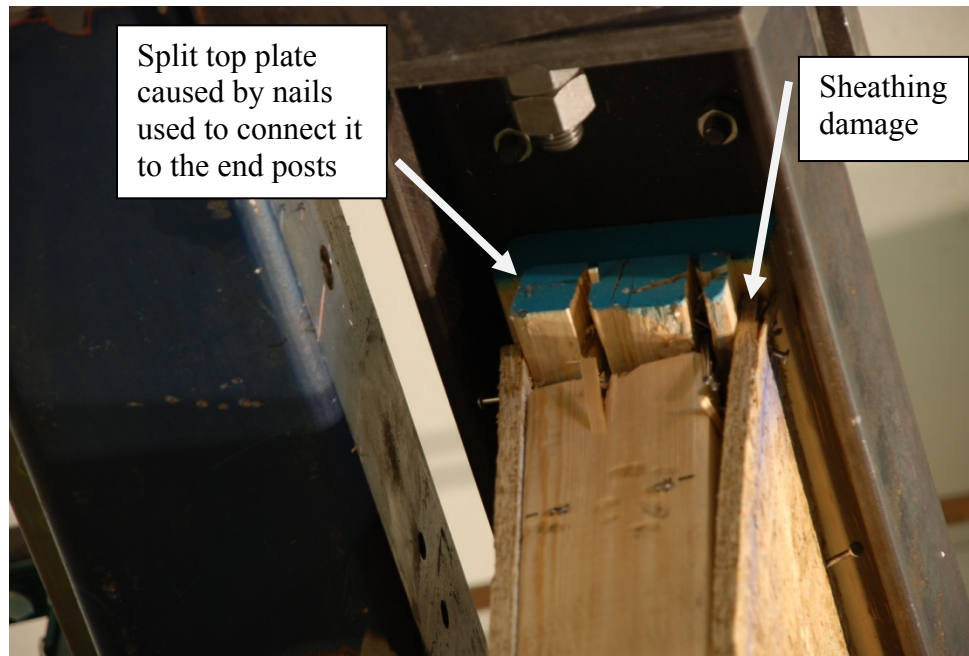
Damage to top plate and sheathing of Specimen A1Bearing-3C after Fatigue 1
